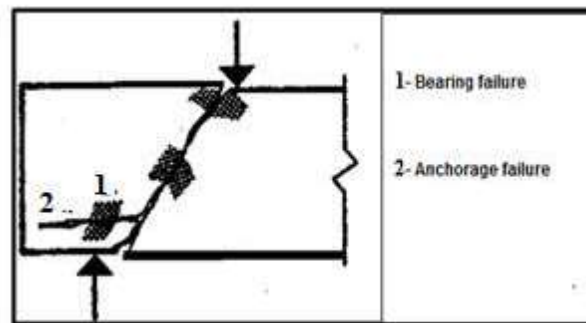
Bearing and Anchorage failures in deep beam (Kong et al., 1970)
